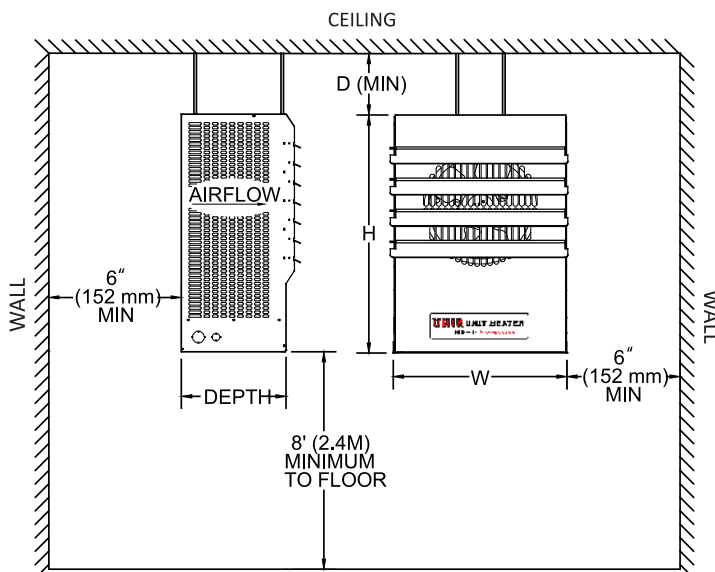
HORIZONTAL CEILING MOUNT WITH THREADED ROD
